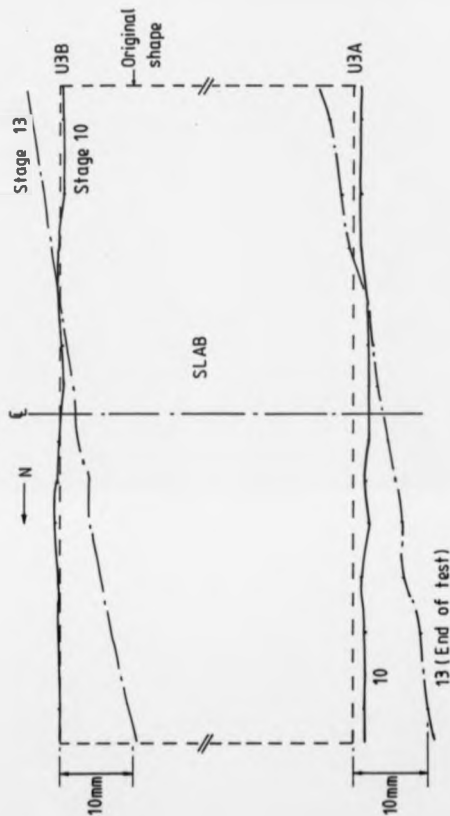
Lateral movement of concrete slab for specimen U3
